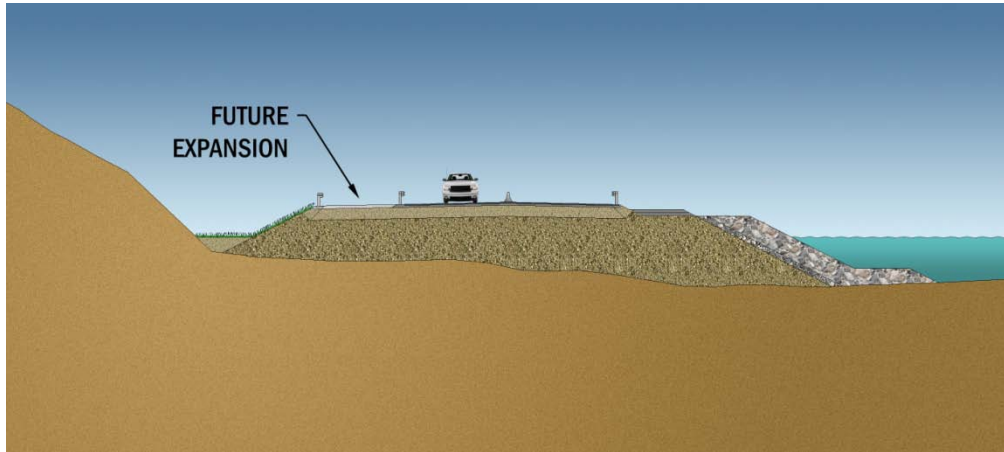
Typical cross section of a roadway approach for the KAC. (Future expansion refers to the addition of pavement.)
